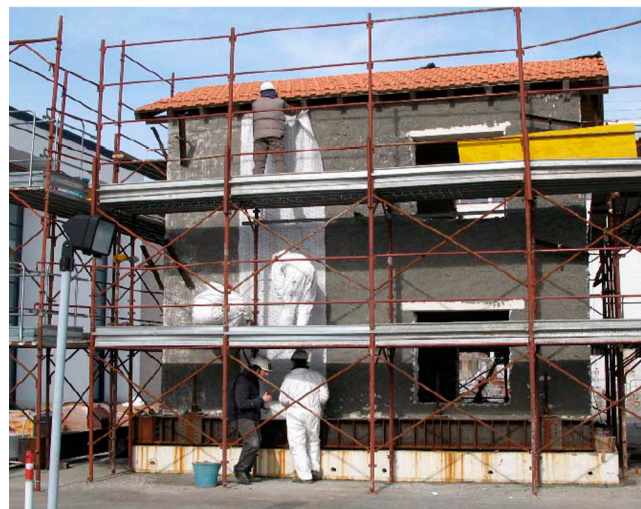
Application of the multiaxial textile with integrated SHM sensors on a stone masonry building within the POLYMAST project (from [127]).
